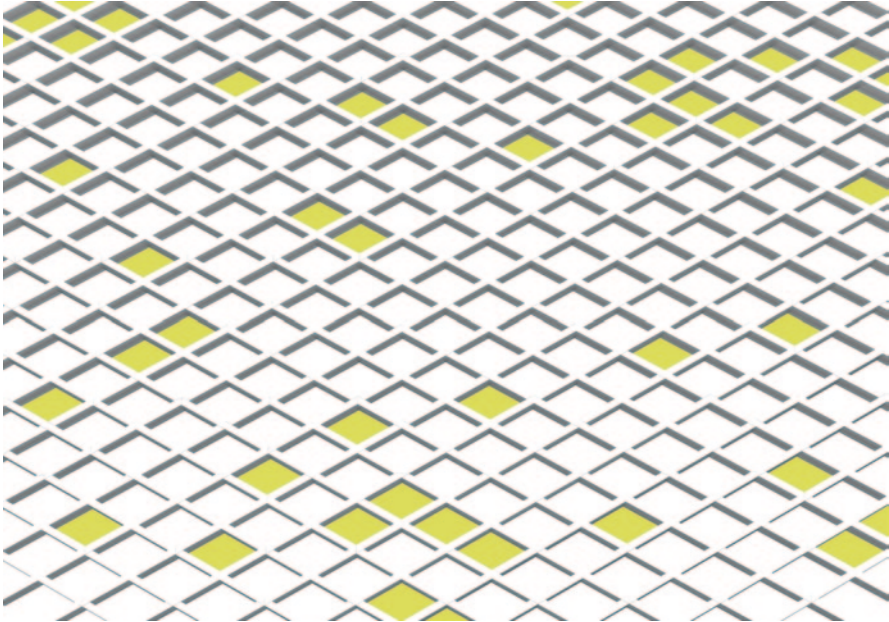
Gradient concrete floor with differently treatable fields, developed by Pohl Architects and Lightweight Construction Institute (Leichtbauinstitut) Jena
